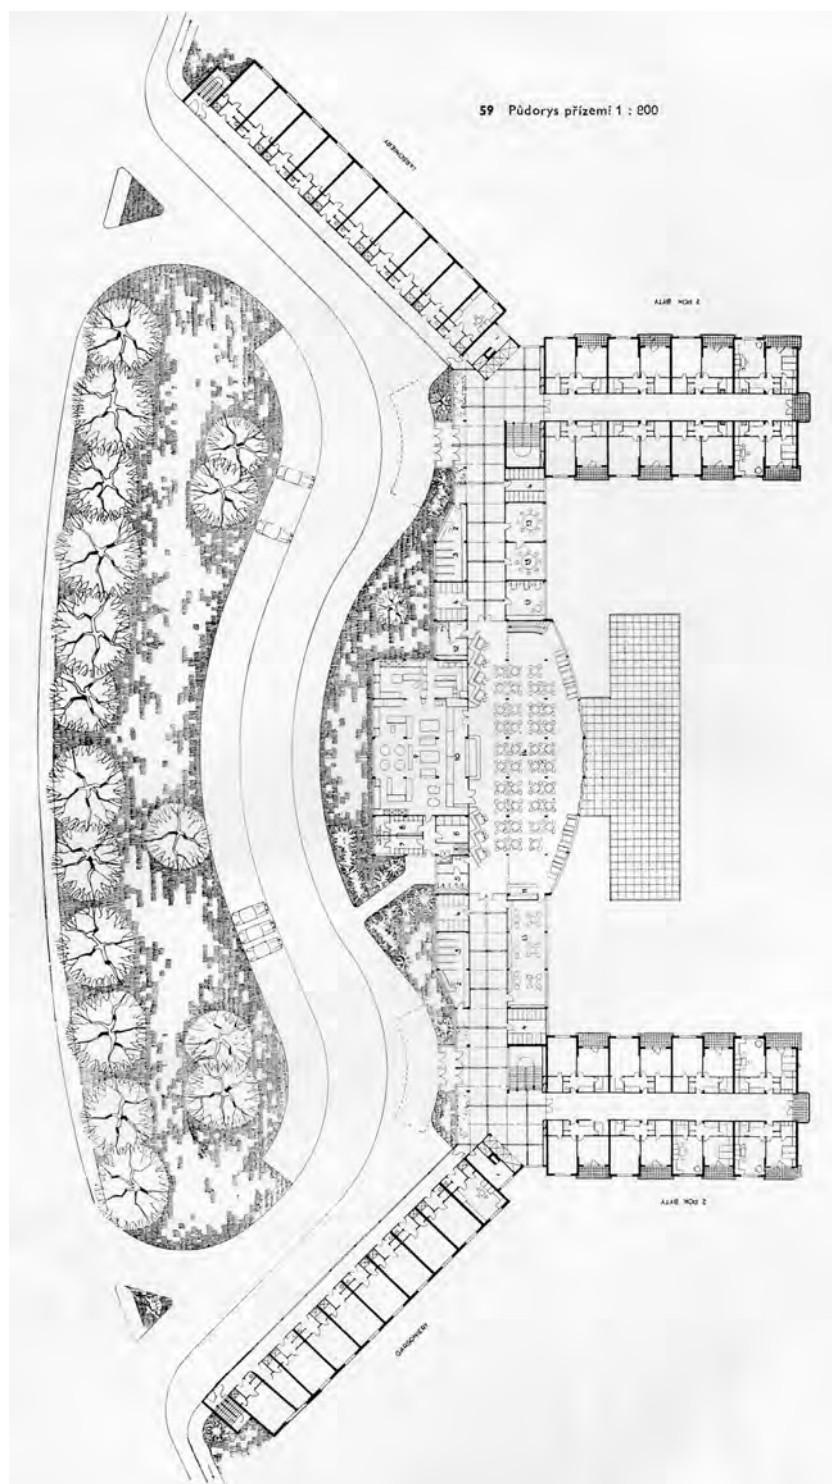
COLLECTIVE HOUSE, LITVÍNNOV, GROUND-FLOOR PLAN, 1946–1958.
